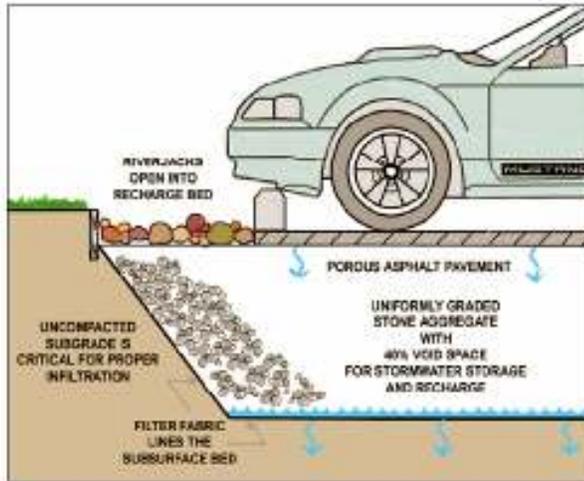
Permeable pavement cross-section (Source Cahill and Associates)
